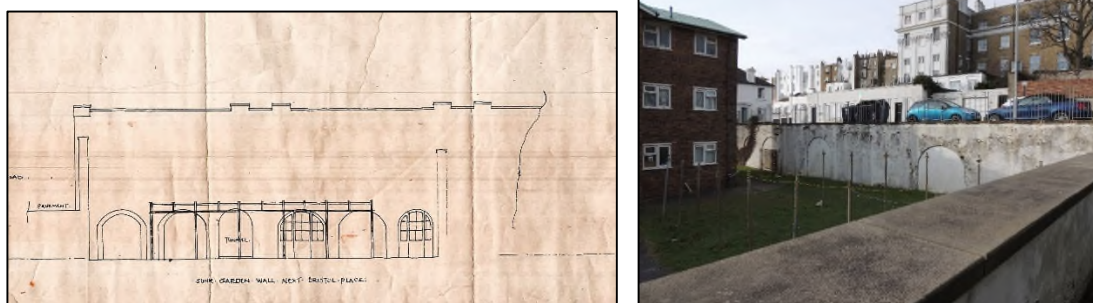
Evidence of vaults in the retaining wall. Left: detail from Lutyens' drawings, 1918-19 and right: view looking towards rear of No 39/40 in 2016. Photo: author, 2016
